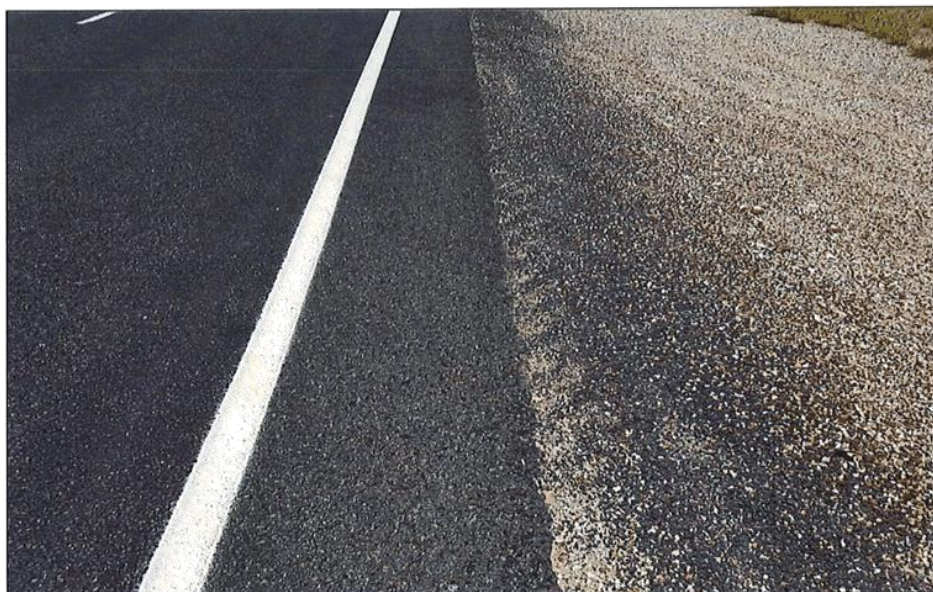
Southern Road Shoulder at Proposed Access (Turning East from Proposed Access)
